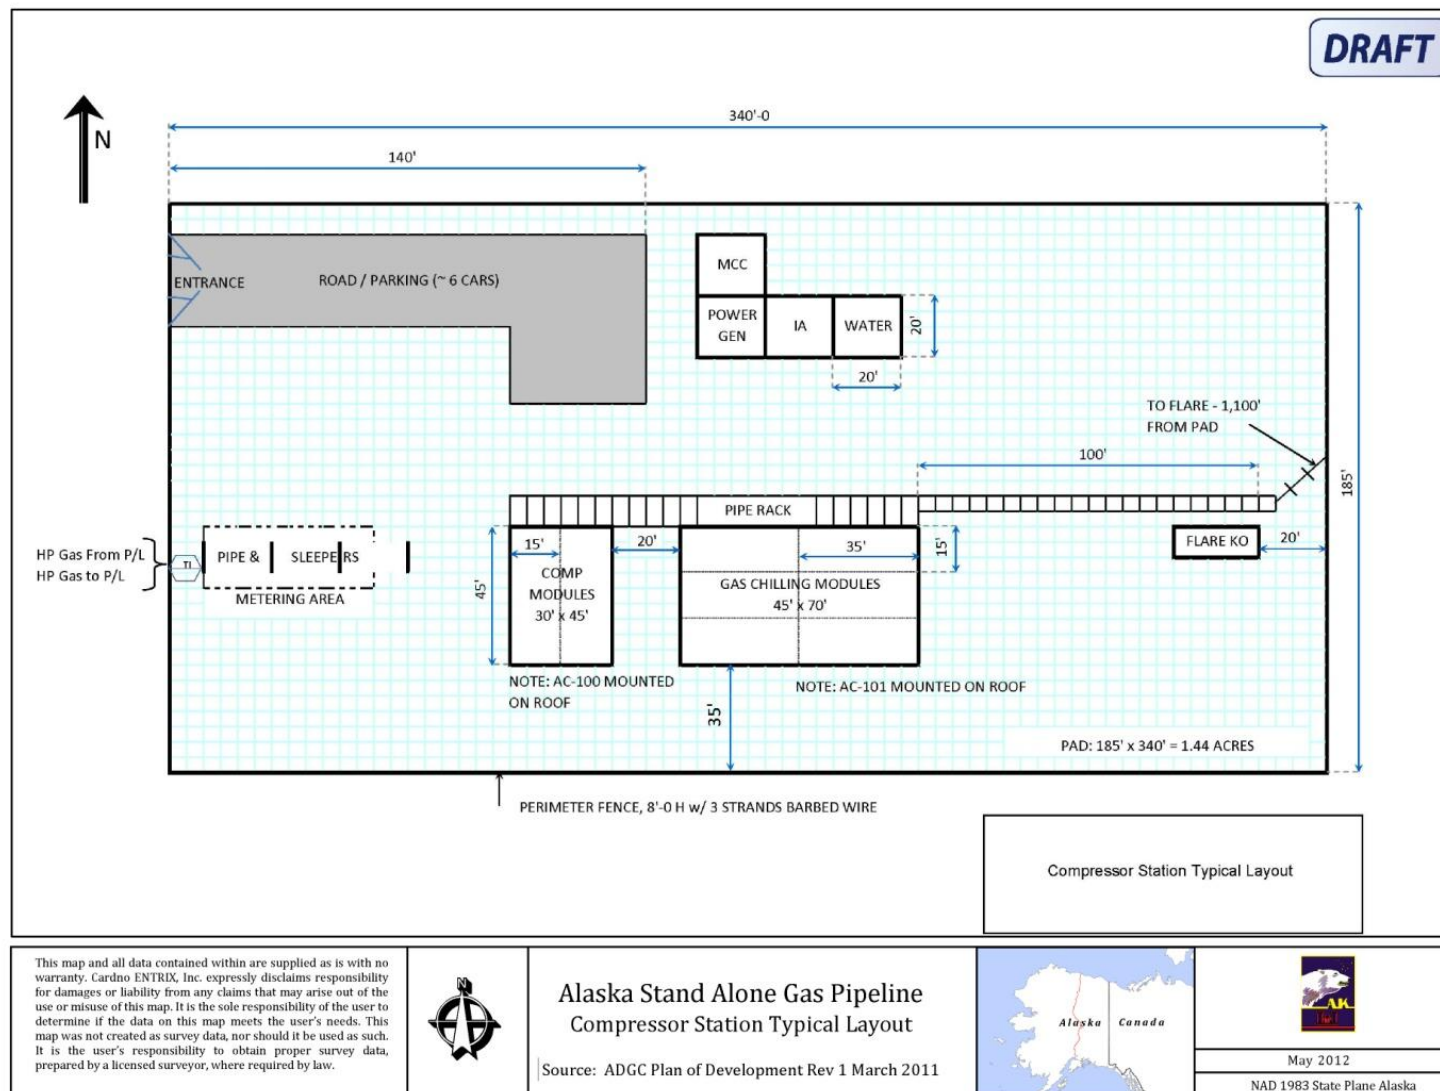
Typical Layout of Stand-Alone Compressor Station
